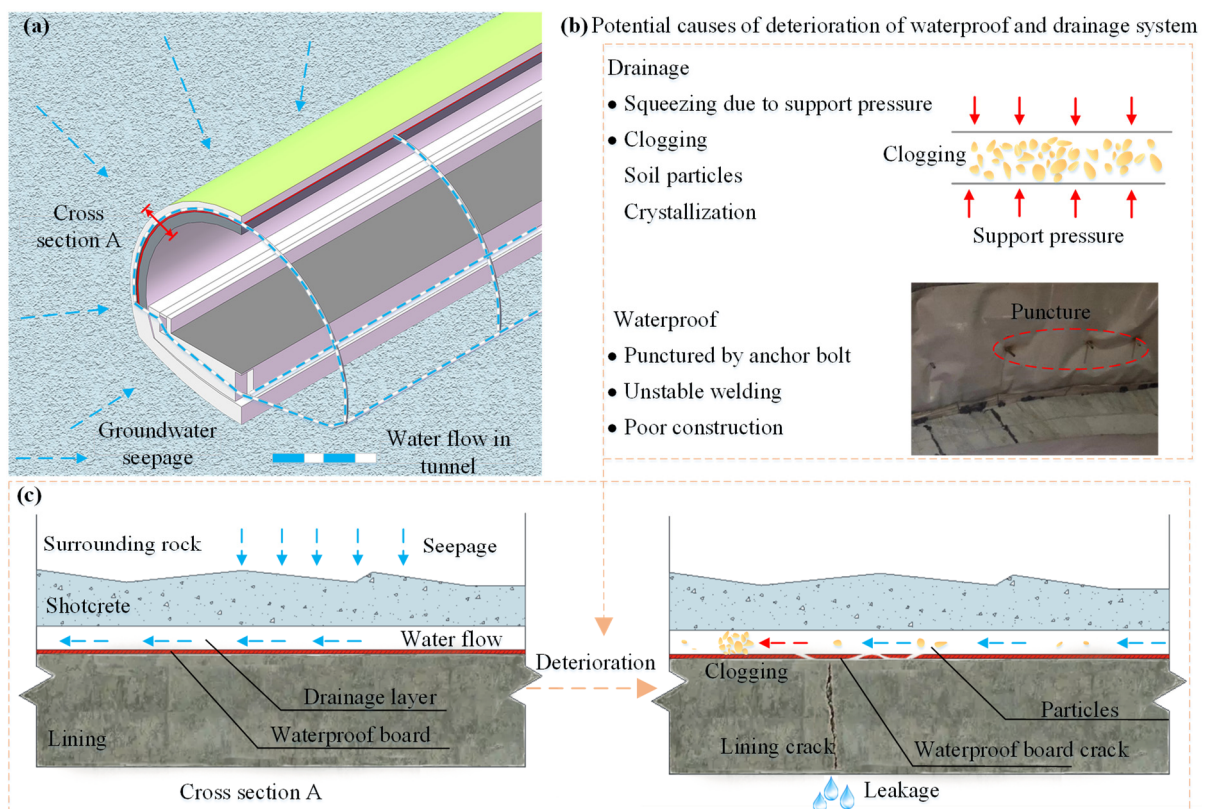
The diagram of tunnel deterioration. (a) water flow in the tunnel; (b) potential causes of deterioration; (c) leakage from the crack of section A.
